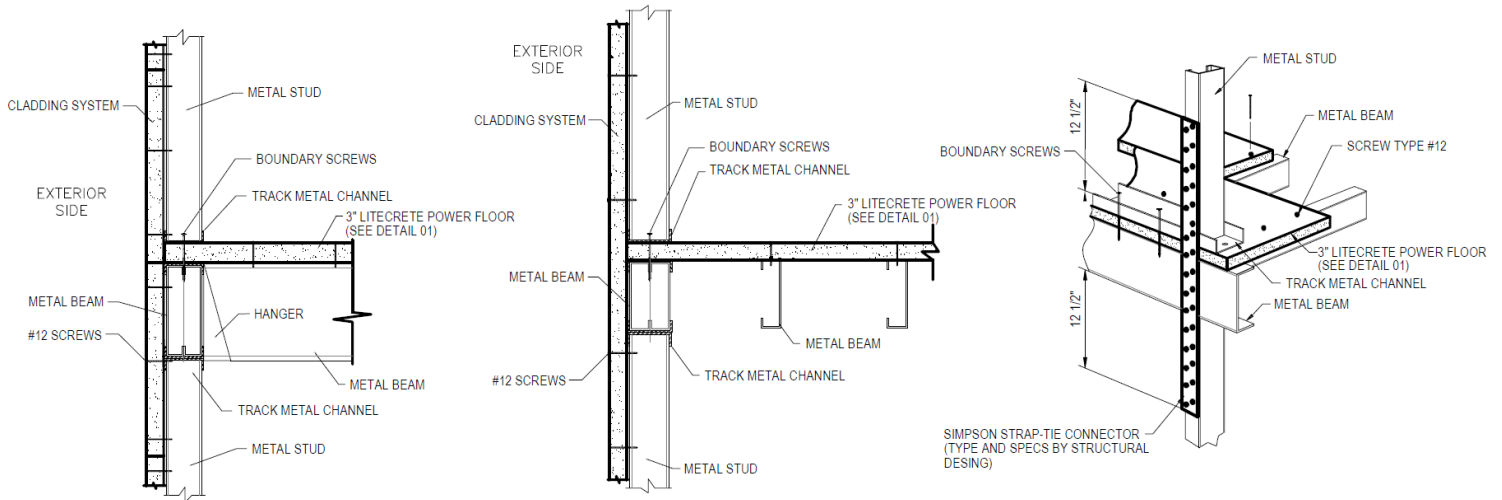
LITECRETE POWER FLOOR SYSTEM LAYOUT
